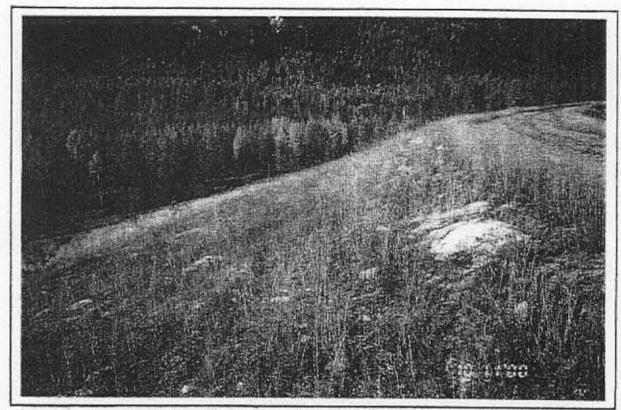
SOUTHWEST CORNER OF TAILINGS EMBANKMENT LOOKING WEST. THE CREST AND THE DOWNSTREAM SLOPE OF THE EMBANKMENT ARE SHOWN.
